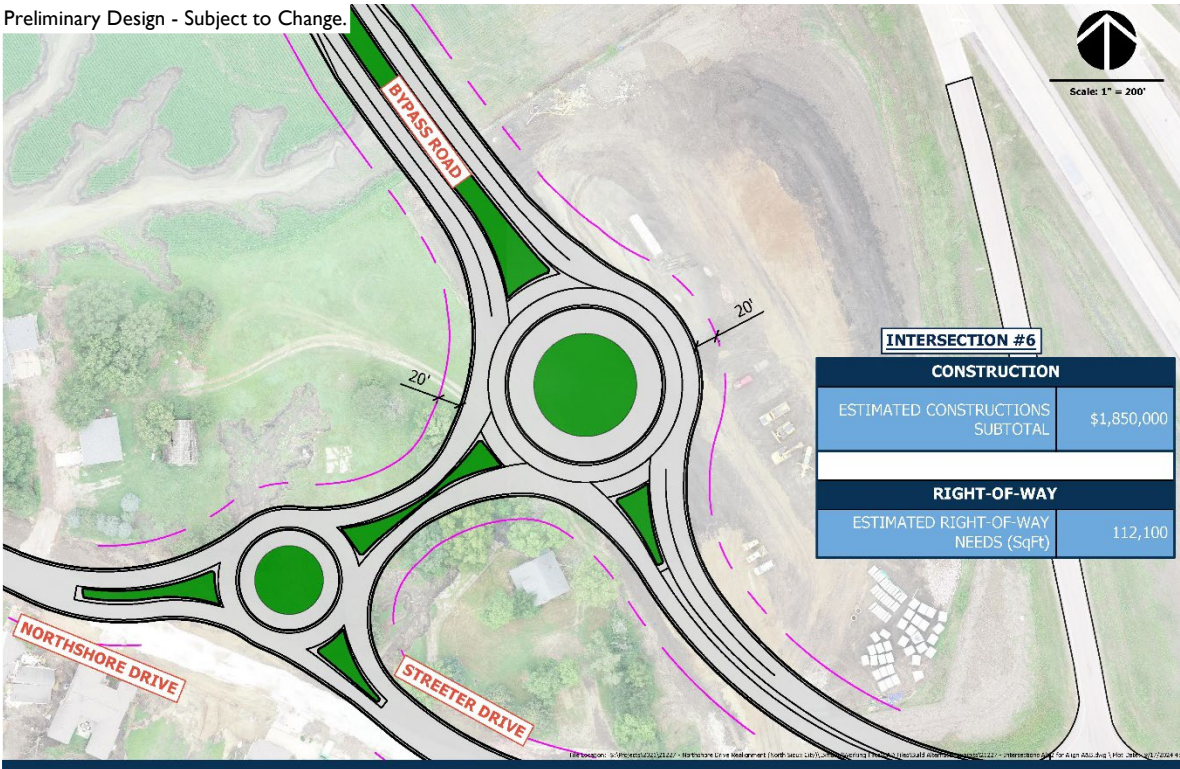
Roundabout at Intersection of New Connecting Roadway with New Bypass Roadway
